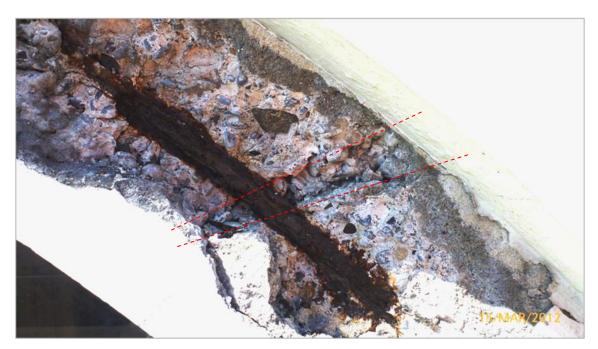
Heavily-corroded trim bar above the Bay 6 gallery window. The reinforcement is encapsulated in poor quality concrete which affords little corrosion protection to the steel; in particular note the rubbly material between the dotted lines, which presumably represents a badly-executed cold joint in the construction process.
